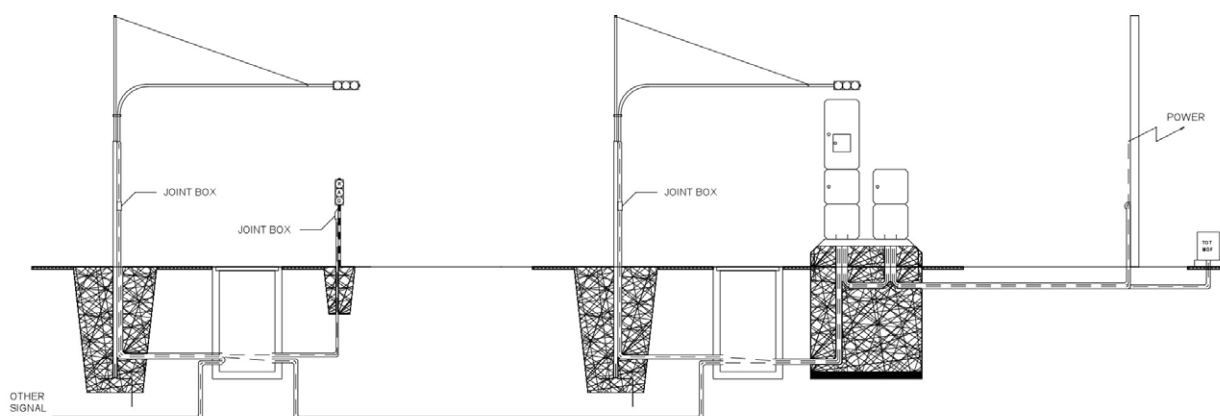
Standard Installation Plan for Local Controllers Related to Near Intersections
